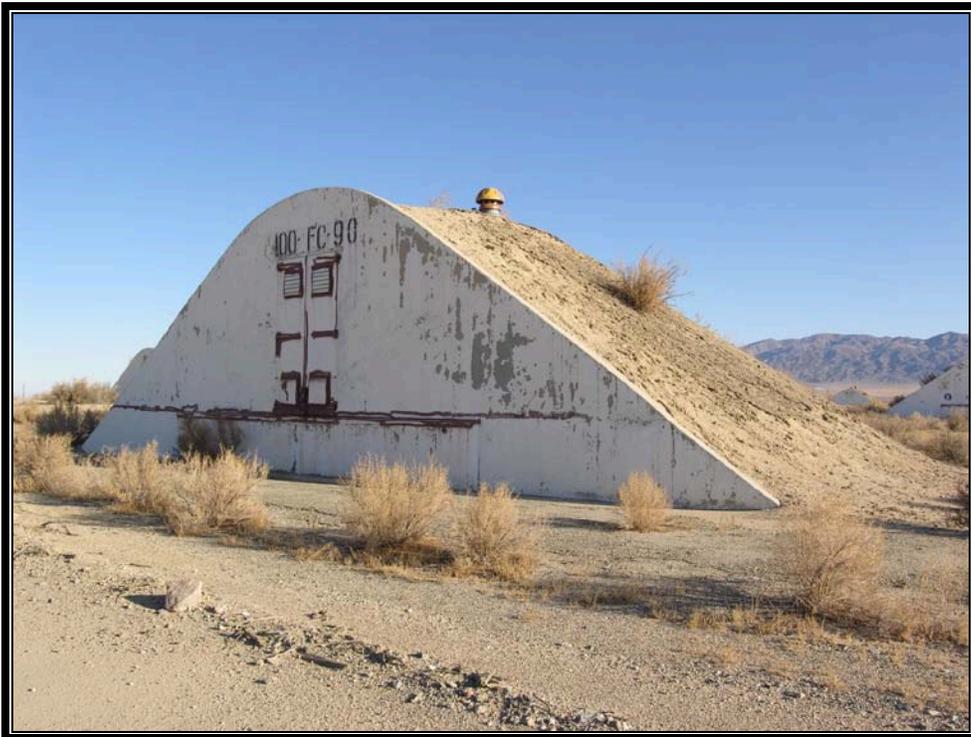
Typical fuze and detonator magazine (Courtesy U.S. Army, 2007)
